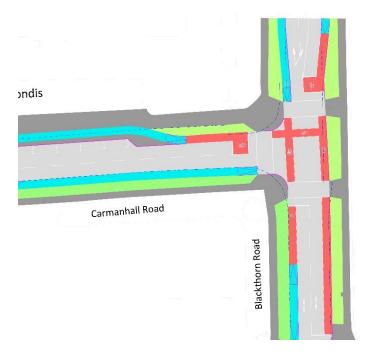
Junction 2: Carmanhall Road / Blackthorn Road (Signalised junction with traffic lane width of 3.25 m)
